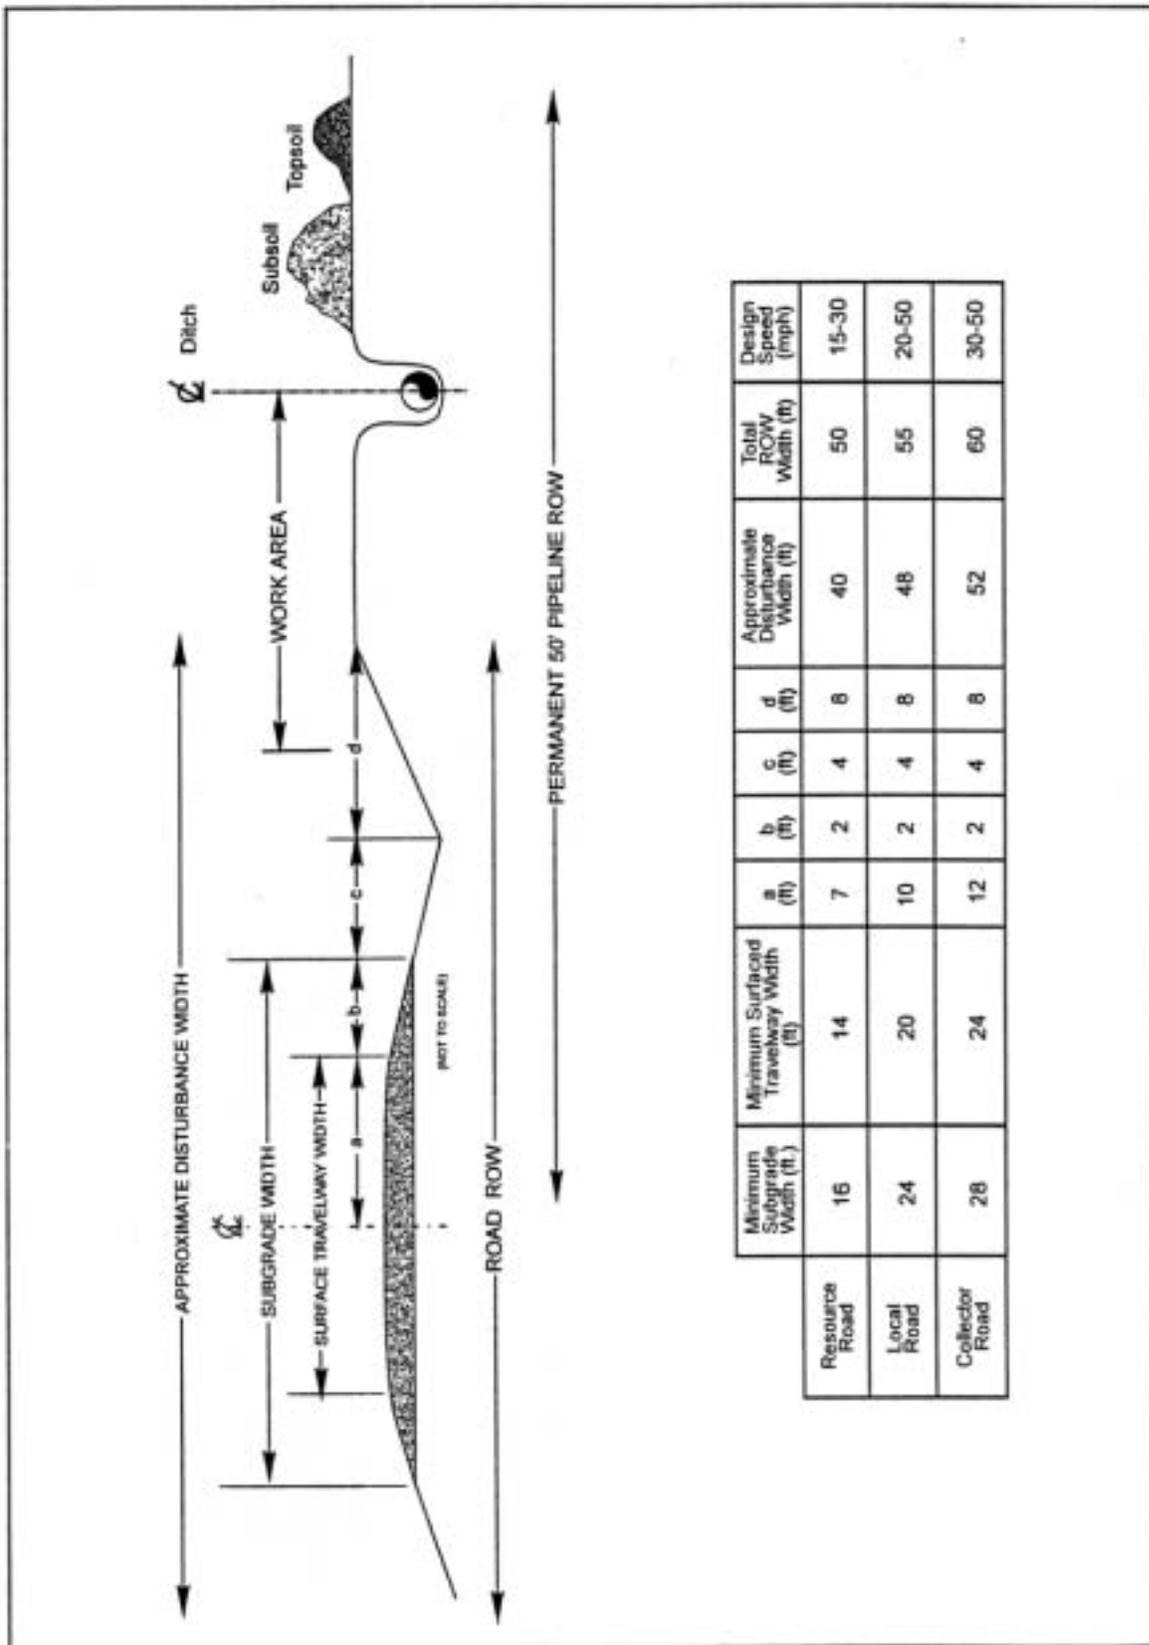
Typical Roadway Cross-section with Pipeline Installation Alongside the Road.
